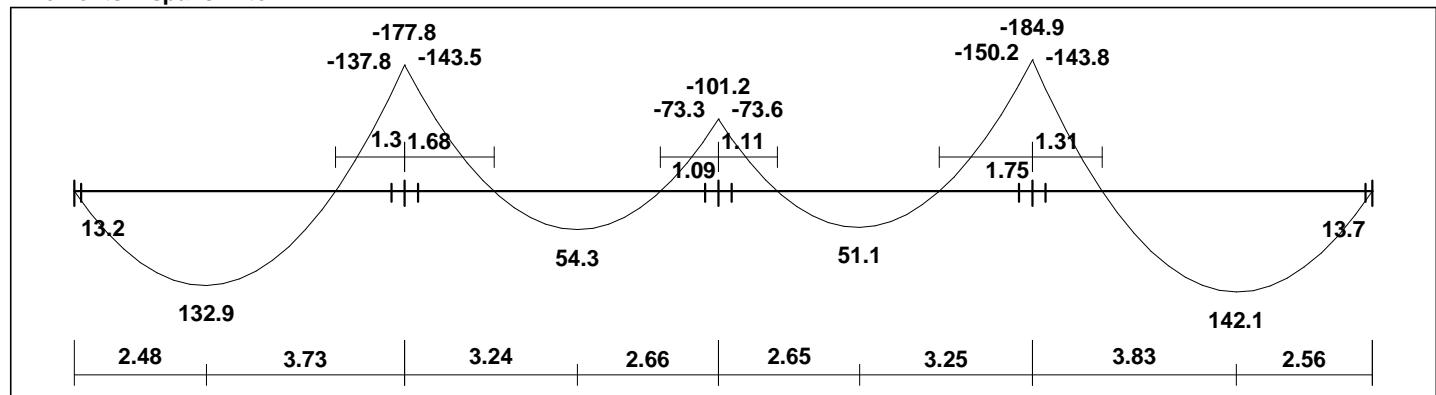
Moment Envelop for Beam (B.F-20)
